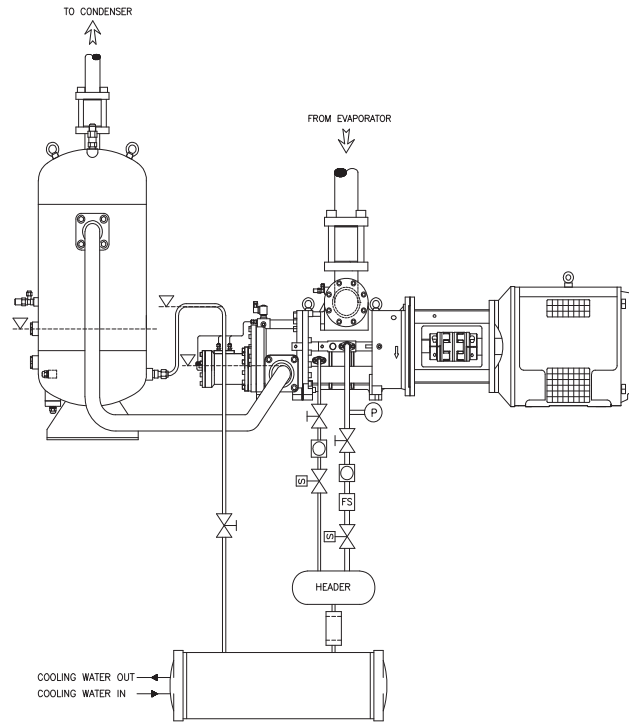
Discharge gas line and oil line design when oil level in oil separator above the compressor level
